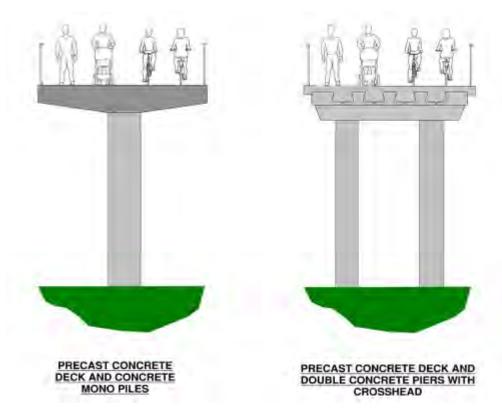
Indicative cross section for reinforced concrete structural forms for elevated ramp structure
